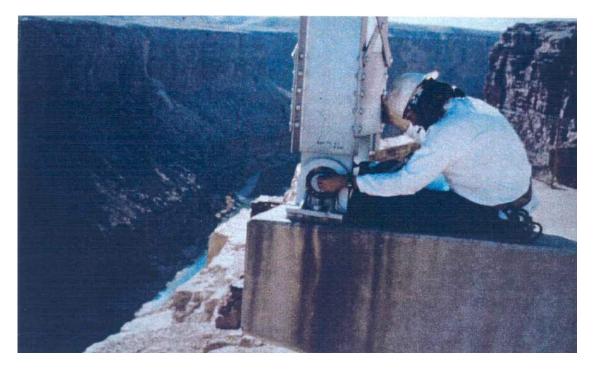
Ultrasonic testing of a bridge pin.
